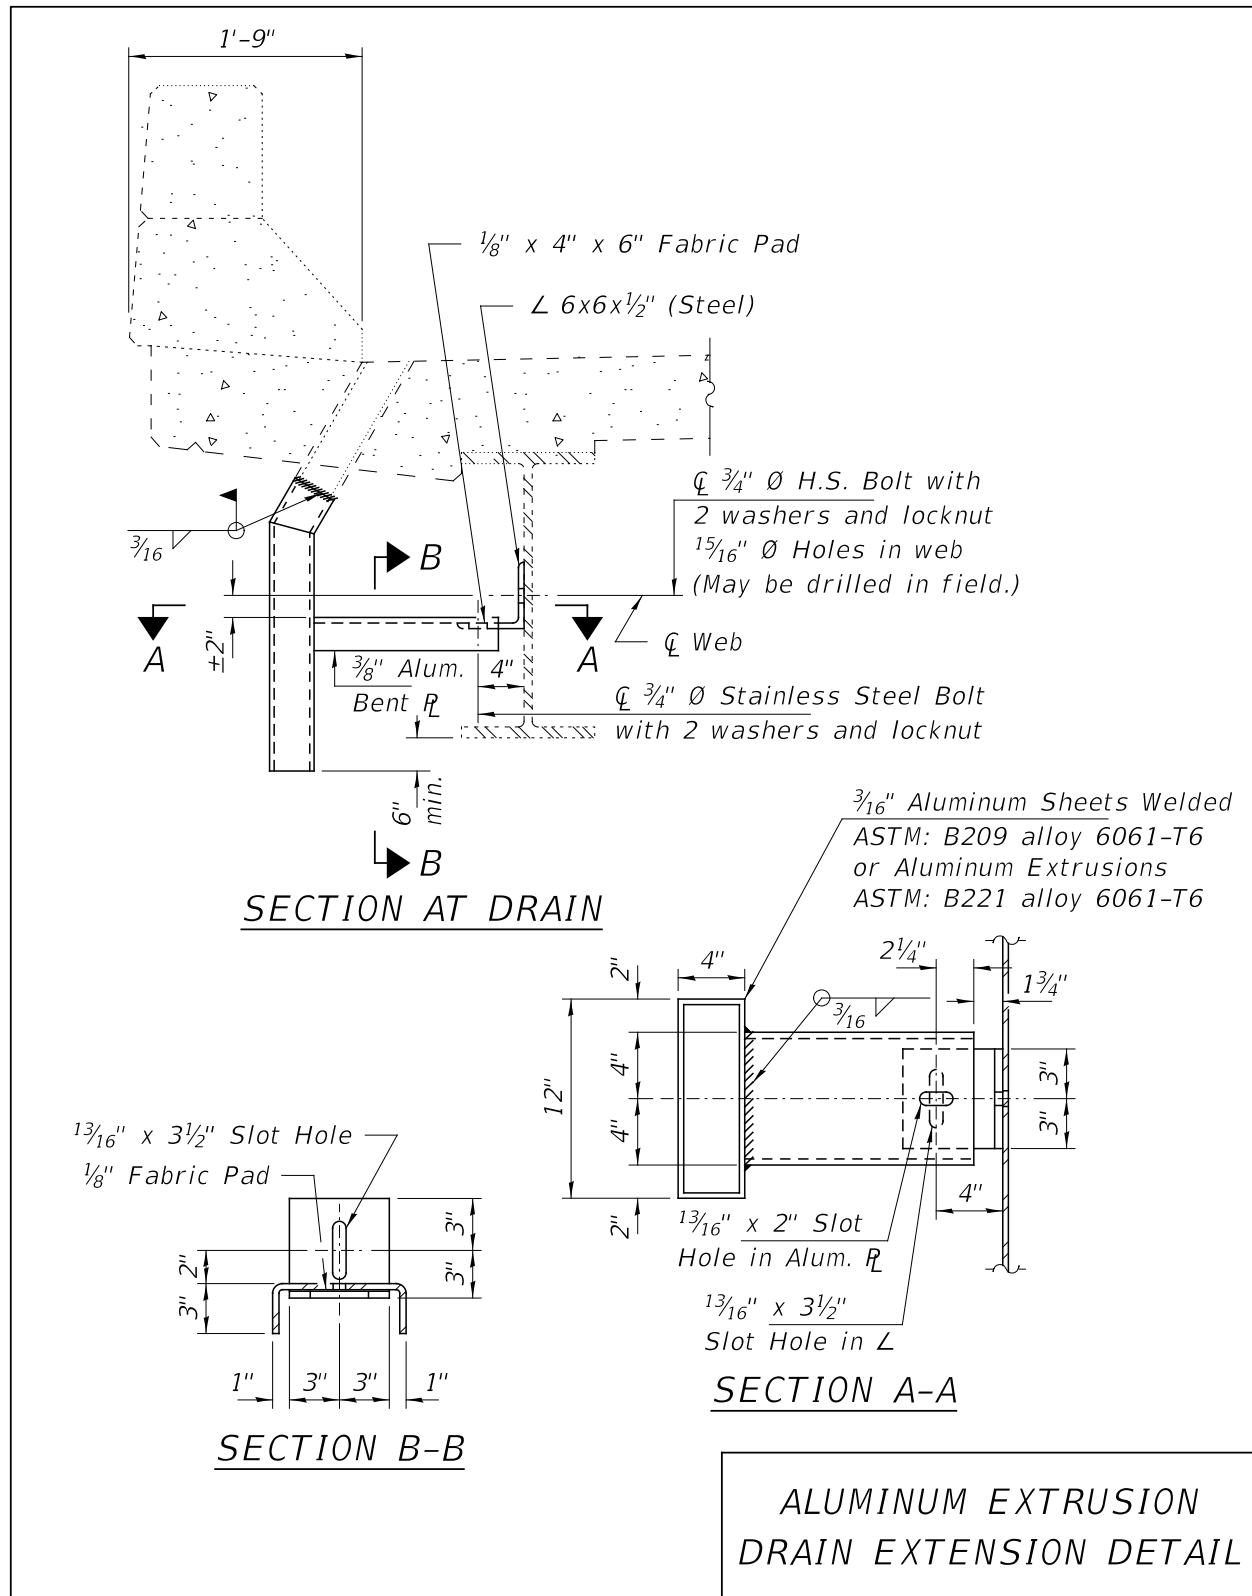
Aluminum Extrusion Drain Extension Detail
